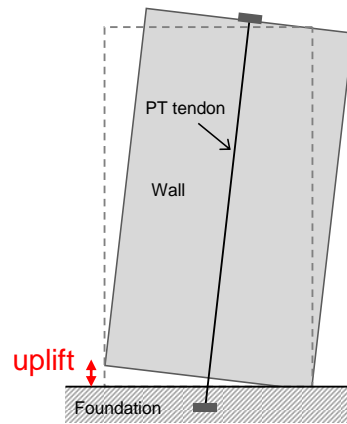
Lateral load behaviour of a post-tensioned rocking wall
